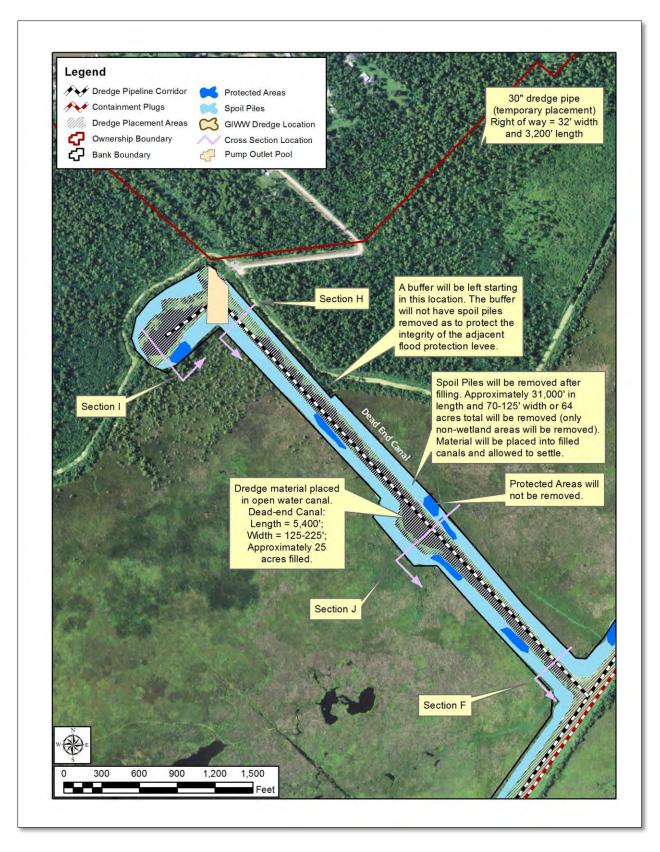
Dredge Placement, Pipe Location, Cross Section Locations, and Spoil Piles.
